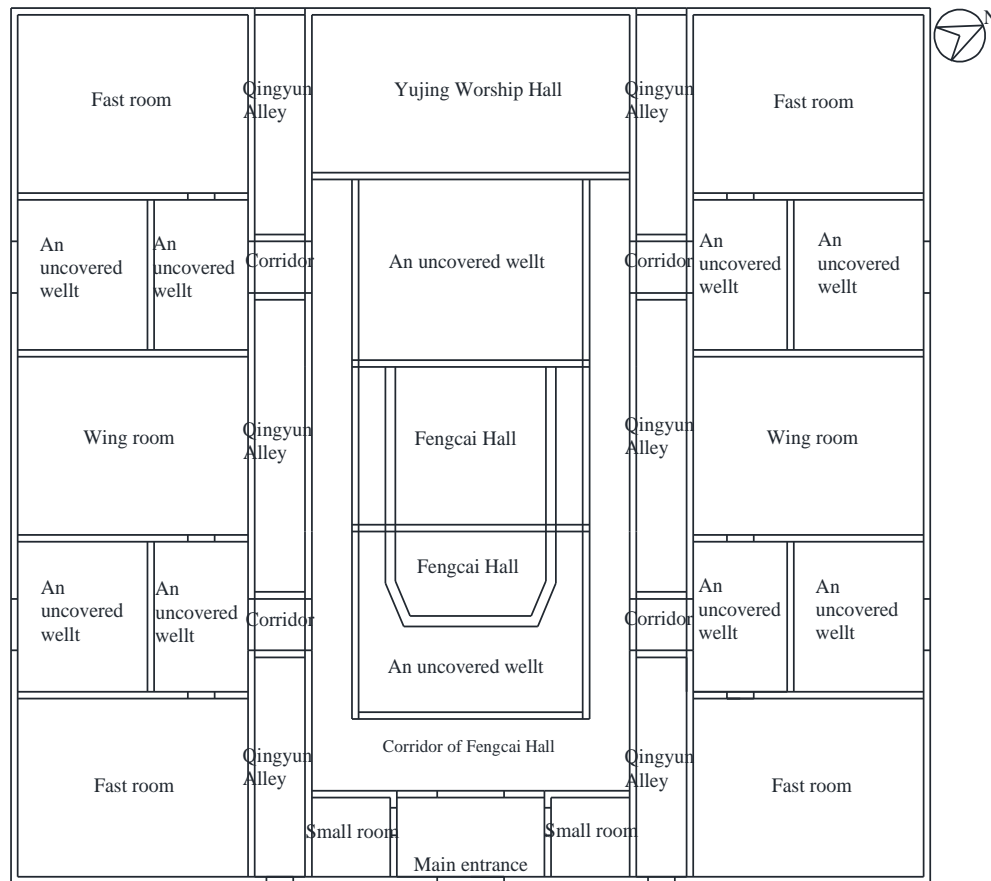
The Floor Plan of Yu Zhongxiang Ancestral Temple in Kaiping
